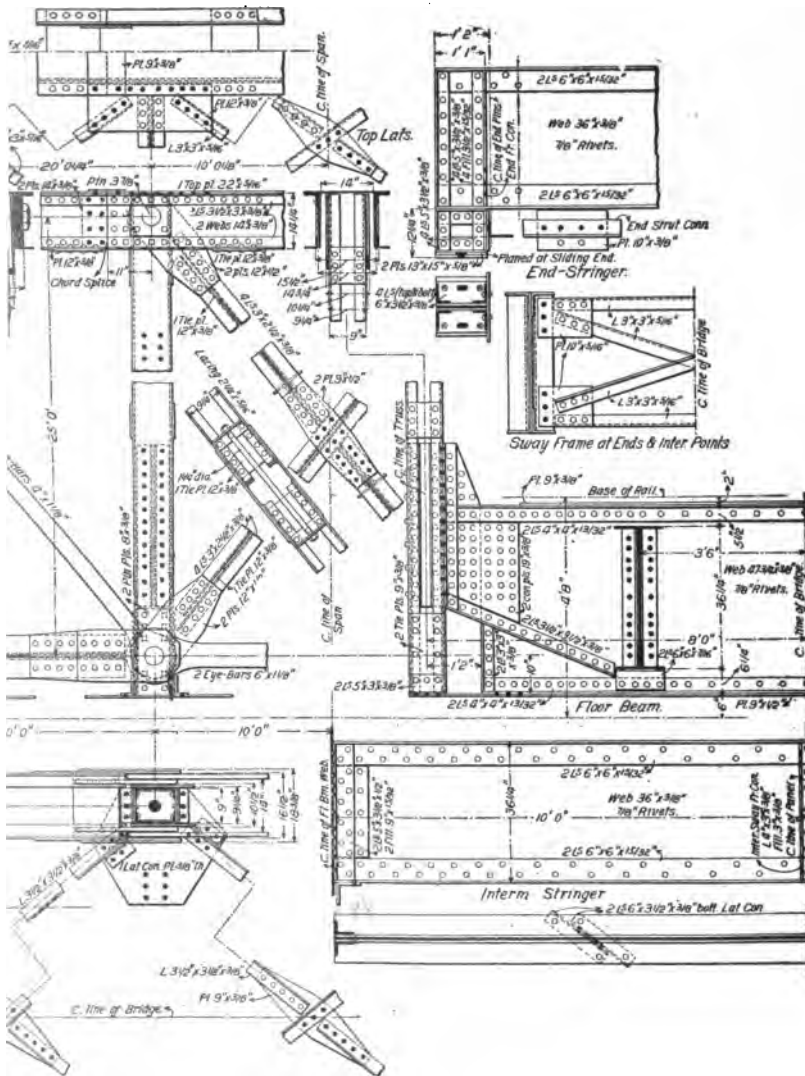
DETAILS OF A SINGLE-TRACK THROUGH BRIDGE OVER
